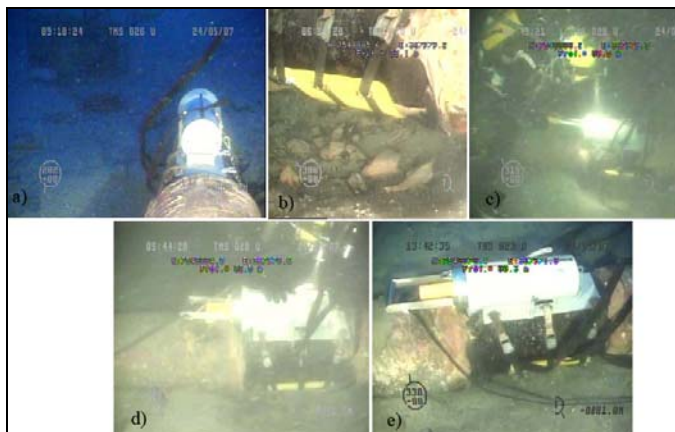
(a) Positioning of the iron basket; (b) Positioning of the plate; (c) Diver placing the irradiator in the basket; (d) Diver checking the placement of the irradiator; (e) Exposition.
